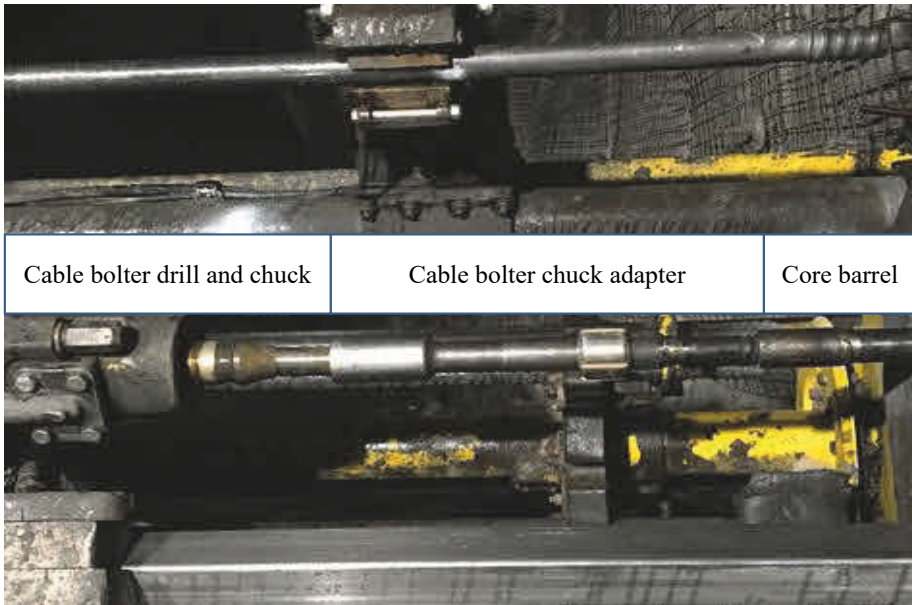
End of drill steel (top), cable bolter with adapter and diamond core barrel attached (bottom).
